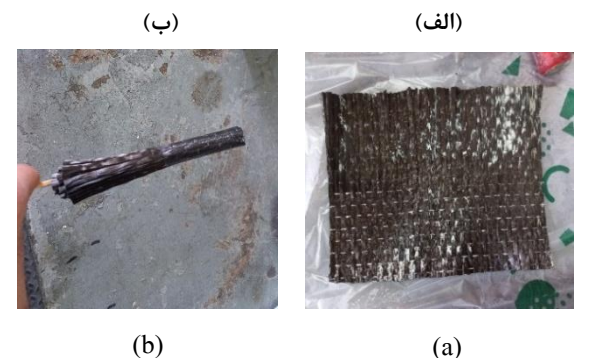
Steps of anchor construction: (a) cutting CFRP to required lengths; (b) rolling the anchor around the dowel
